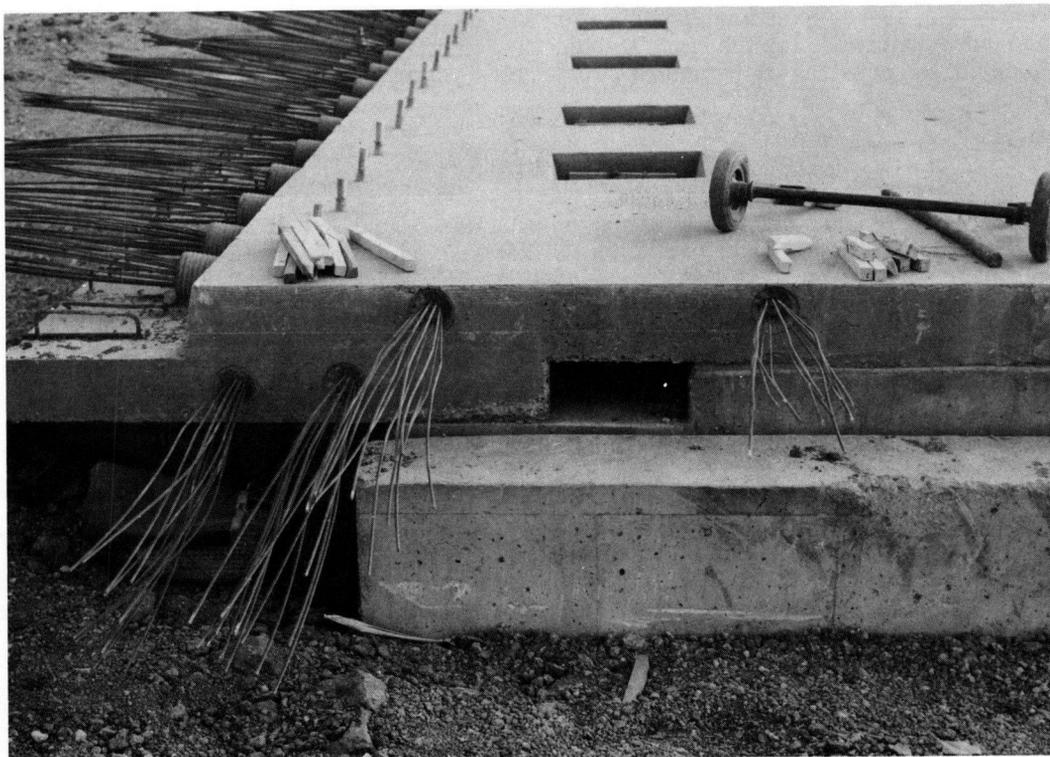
Details of anchorages for prestressed runway under construction at Maison Blanche Airport near Algiers during 1960. Longitudinal wires at left are part of elastic underground abutment which is post-tensioned. The wires in foreground are transverse prestressing for elastic abutment.
